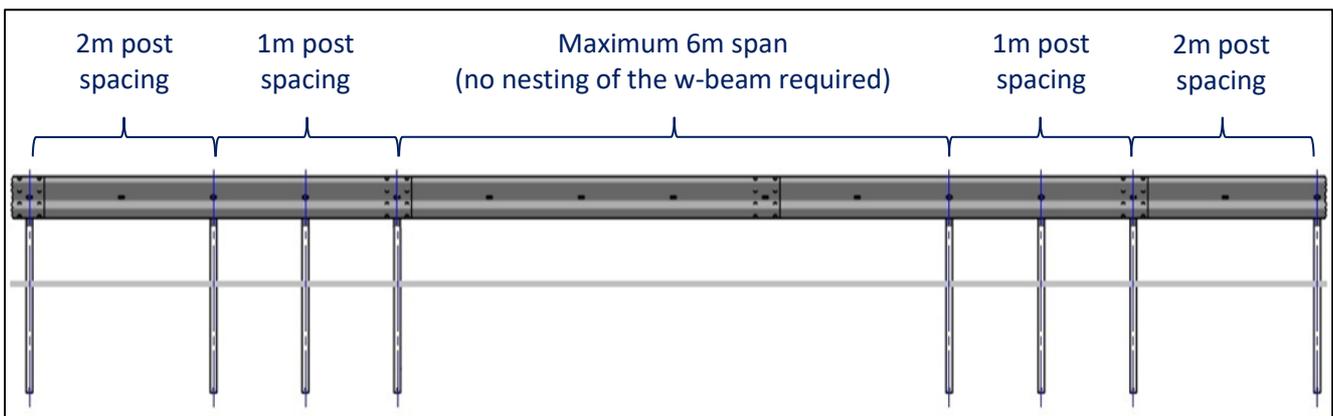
RamShield® W-Beam, 6m Span without Posts.
